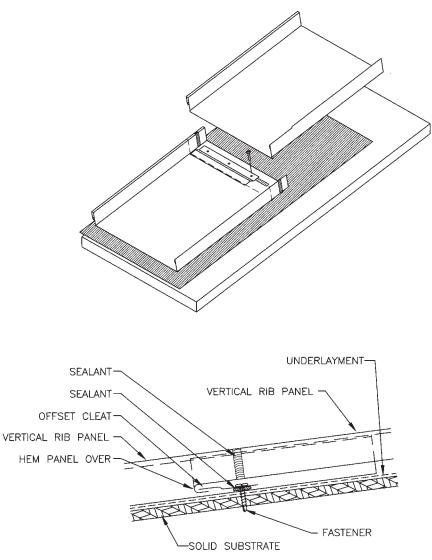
Details of architectural vertical-rib roofing over solid substrate at floating panel end lap. (*MBMA*.)
